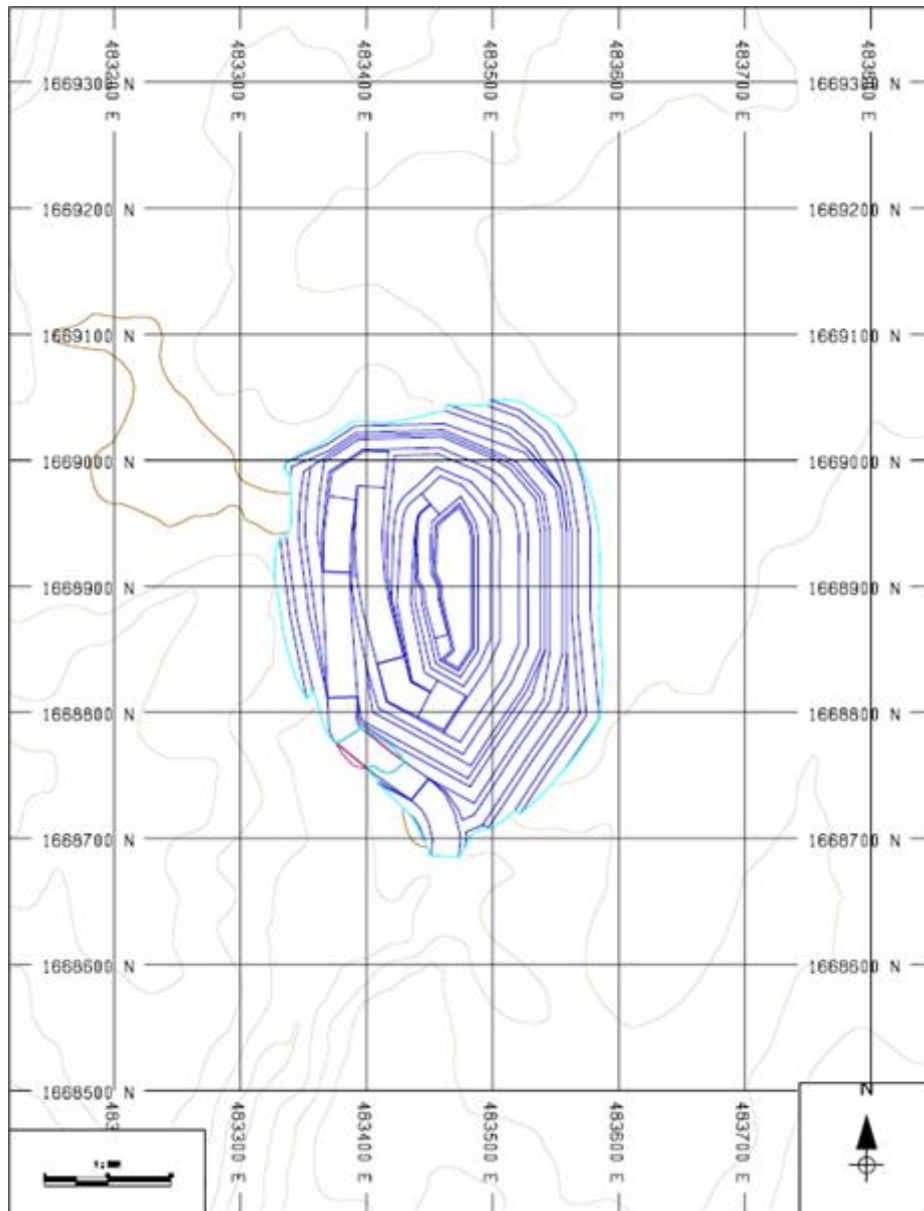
Debarwa Pit Shell Progression<sup>17</sup> (in plan view)
